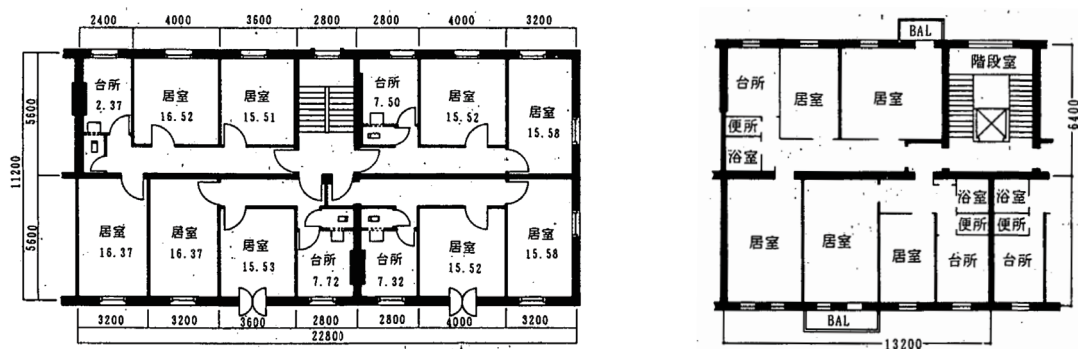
China 301-II type standard design in 1956 (left) Soviet Union II-04 type standard design in 1955 (right)
